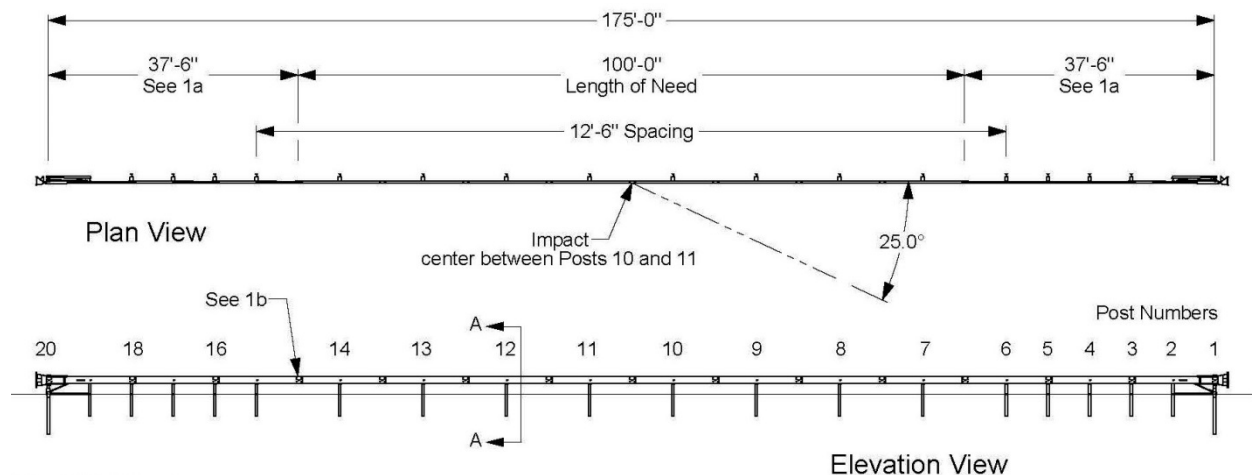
Impact Point for *MASH* Test 2-11 on the 31-inch W-Beam Guardrail with 12 ft 6 inch Post Spacing.
